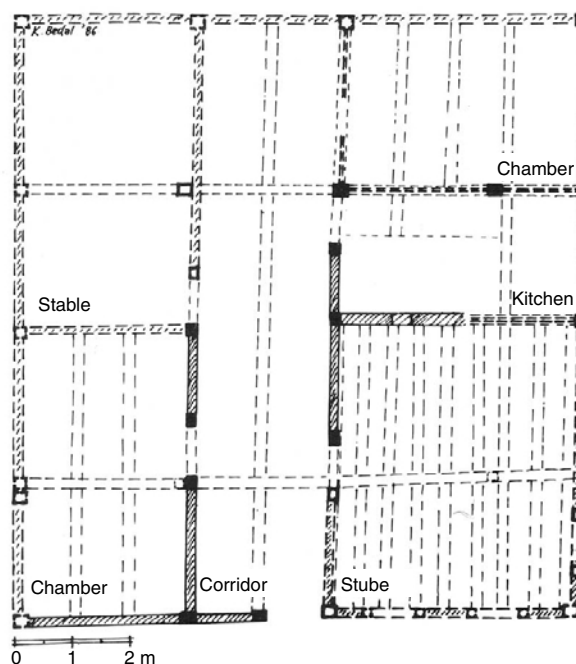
Ninefold ground plan. After Bedal 1987: 37.
